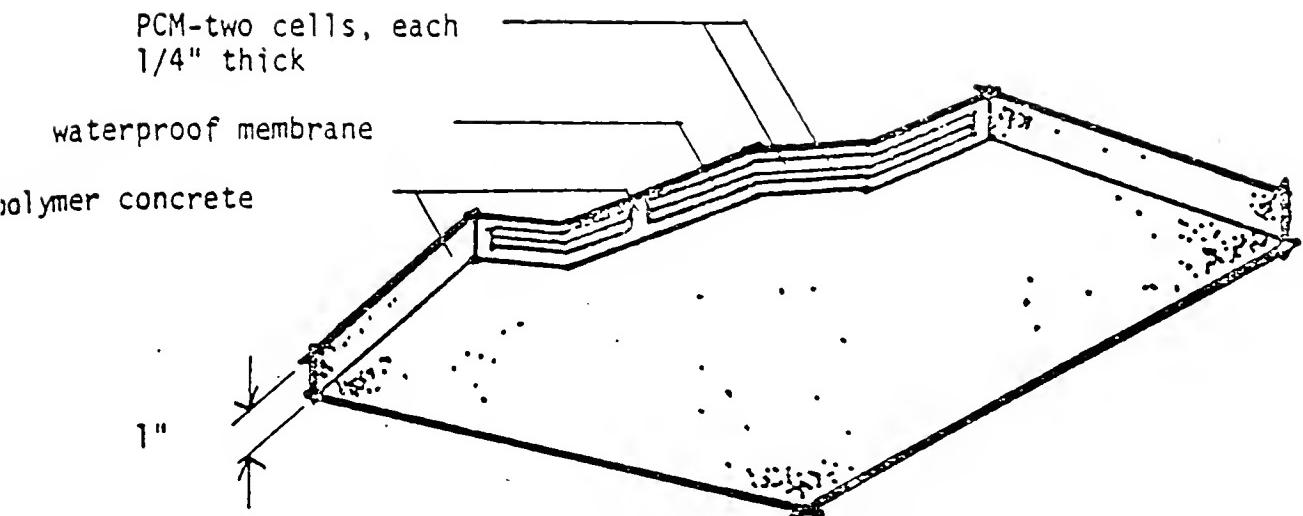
SOLAR CEILING TILE CONSTRUCTION
